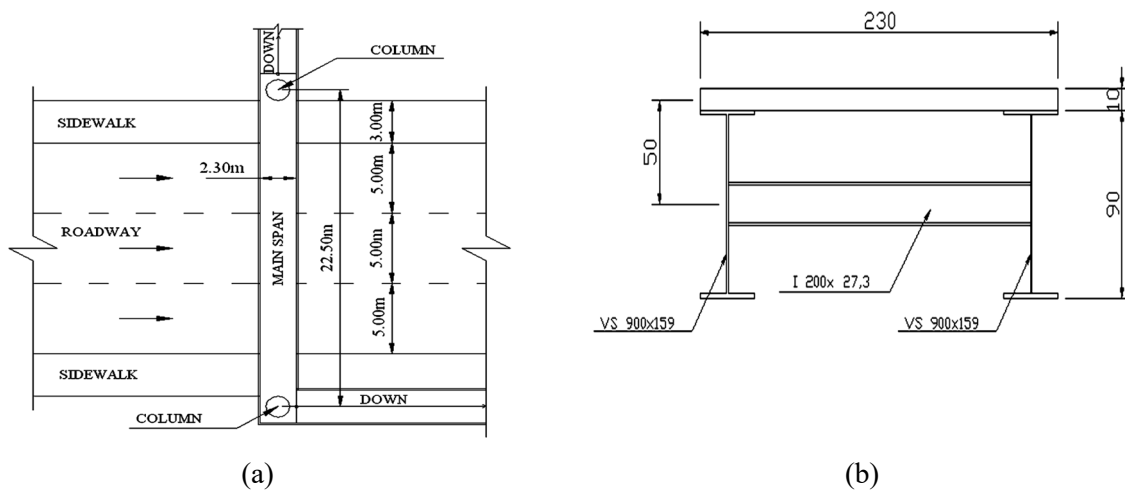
Dimensions of footbridge model: (a) Top view and (b) Cross-section (dimensions in cm).
